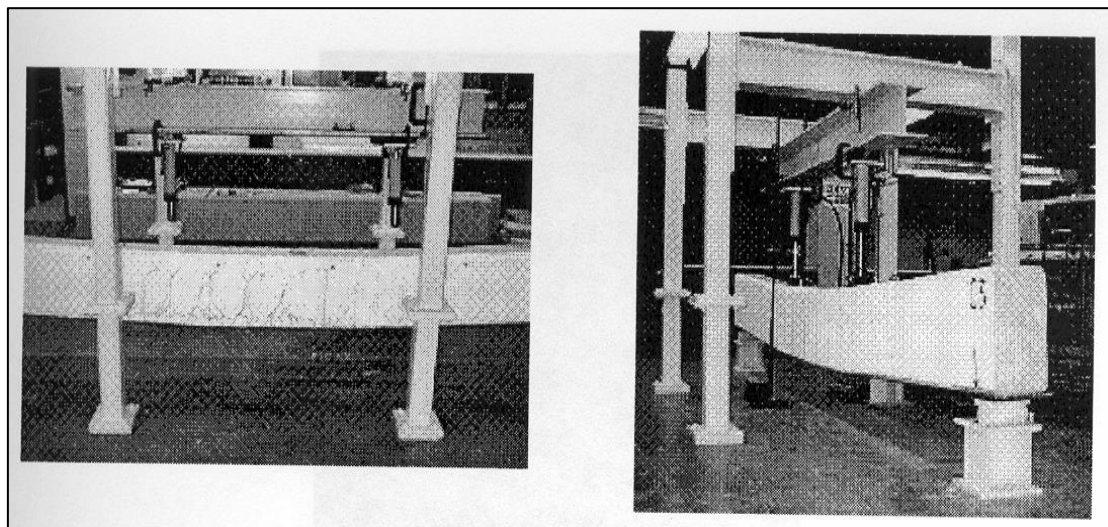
Loading setup and supports arrangement for the beam (Buckhouse 1997)
